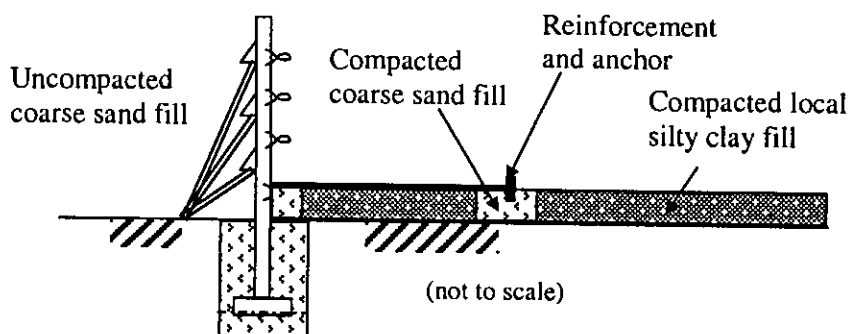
Step 4; Layer by layer filling of backfill and roadway, compaction and placement of anchor and reinforcement
